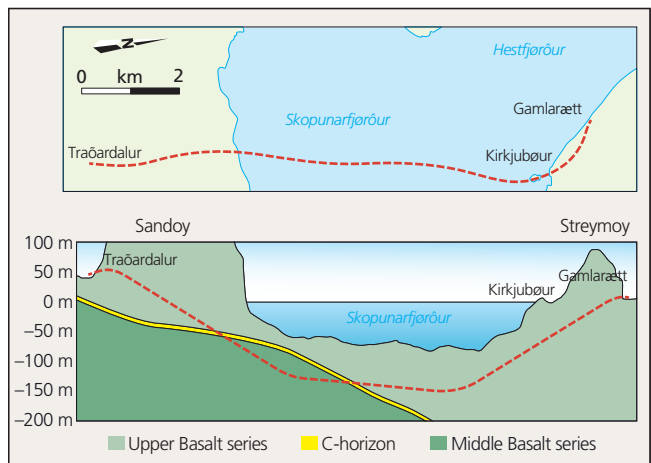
Plan and longitudinal section of Sandoy tunnel (Jardfeingi)
